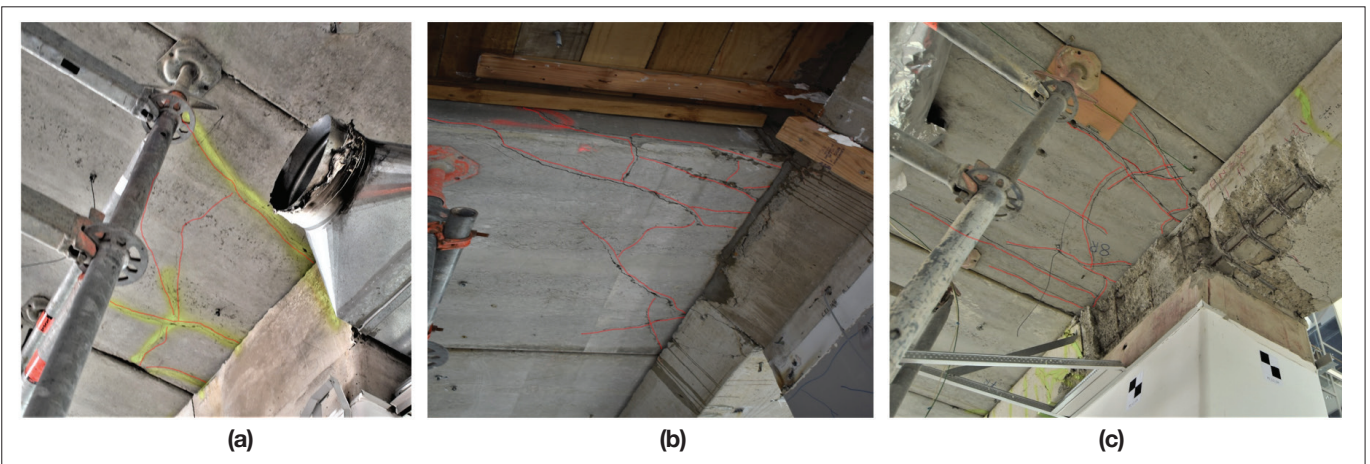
Previously unidentified repeated damage pattern highlighted in red (a) Pier 2 level 4 (b) Pier 3 level 2 (c) Pier 2 level 3
